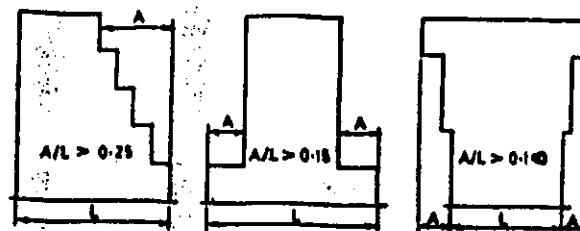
TYPICAL SHAPES OF BUILDING WITH SEPARATION SECTIONS
